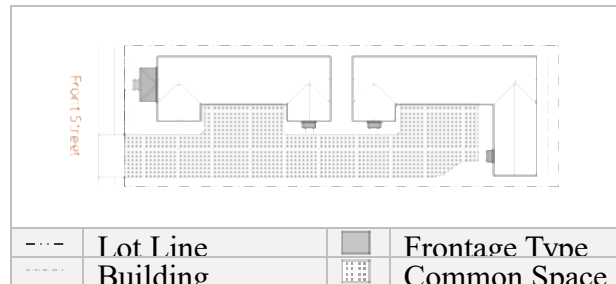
Multiple Buildings on a Lot Without Design Sites
